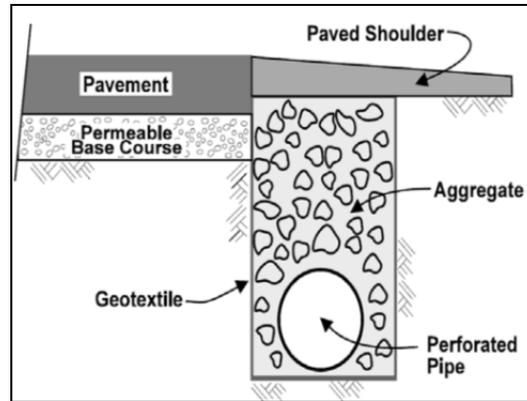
Filtration function provided by a geotextile in a pavement trench drain
